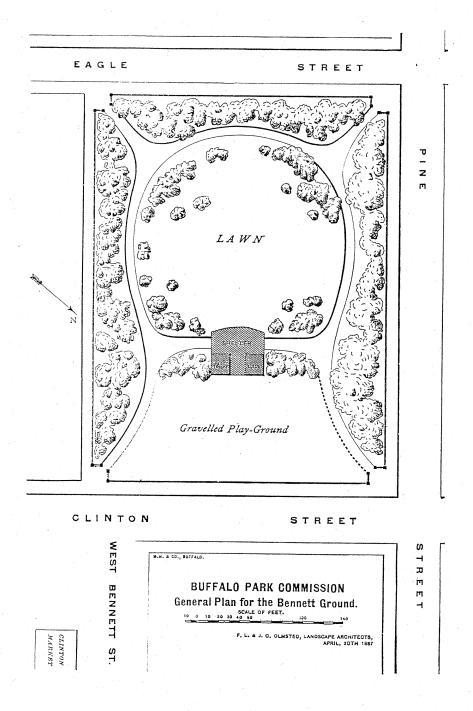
General Plan for Bennett Ground, Buffalo Park Commission, F.L. & J.C. Olmsted, Landscape Architects, April 20th, 1887. Courtesy Beveridge collection.
